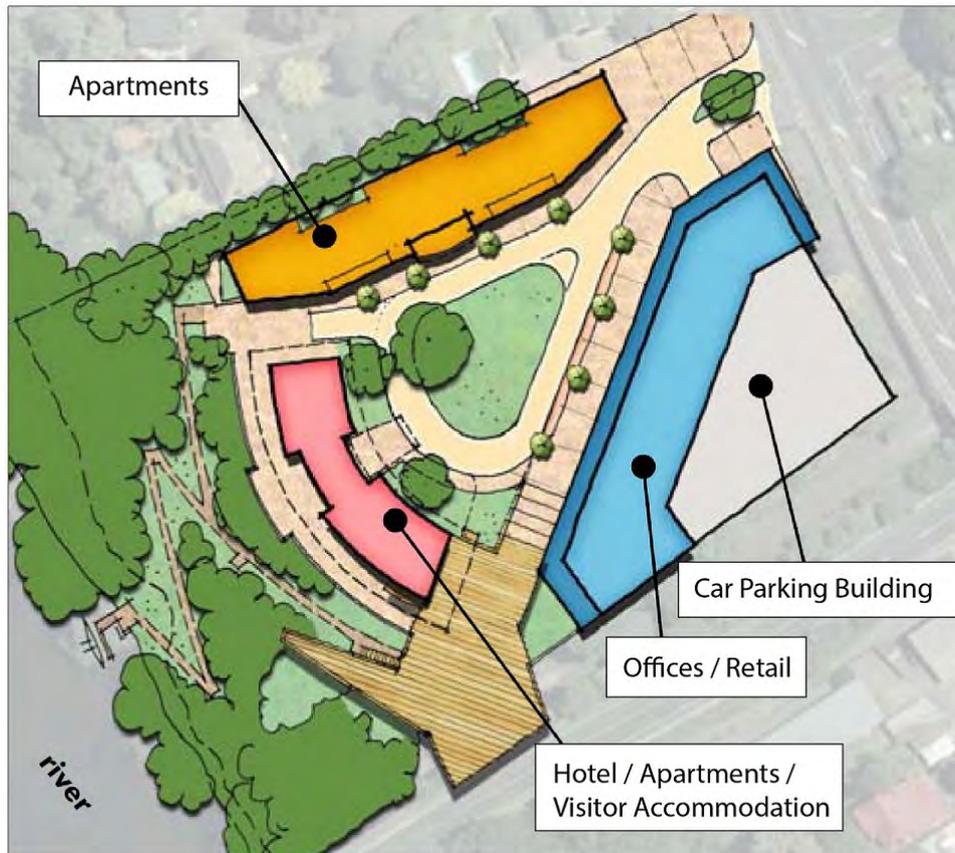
y: Indicative concept plan for Key Development Site 6
